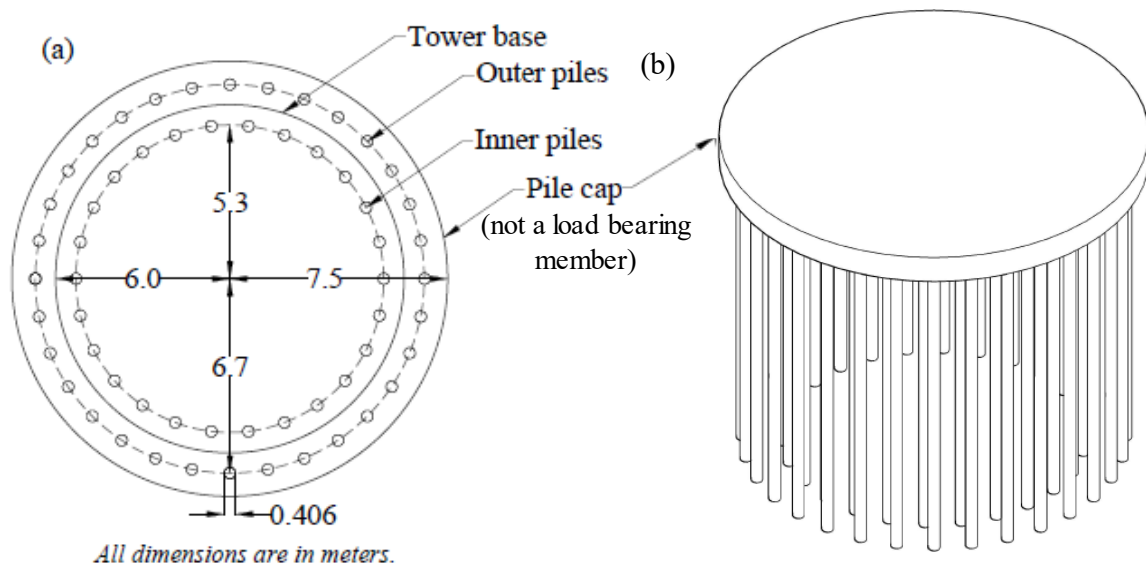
Final design of pile group foundation in clay (a) Plan view and (b) 3D view (length of pile is not to scale)
